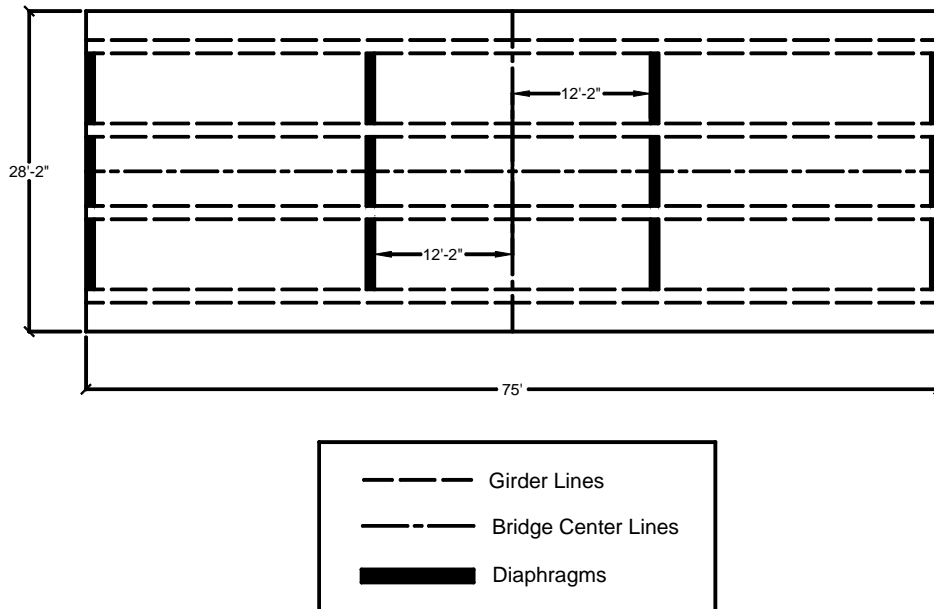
Diaphragm Layout – Lake LBJ Bridge
